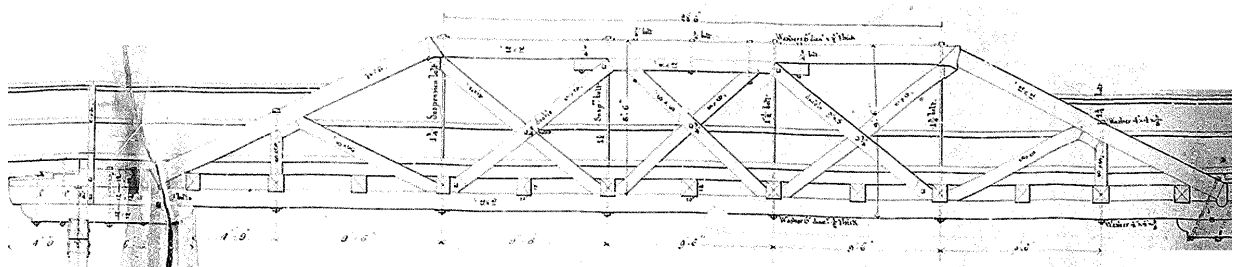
Bennett's Christmas Creek Bridge, 1865 (70' Spans)
